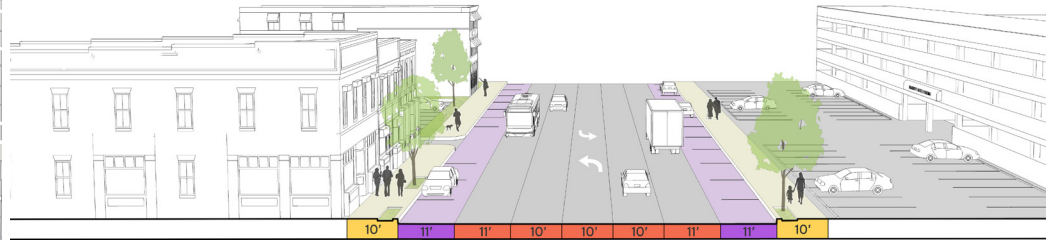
MAIN STREET TYPICAL EXISTING SECTION NORTH OF LINWOOD BOULEVARD
